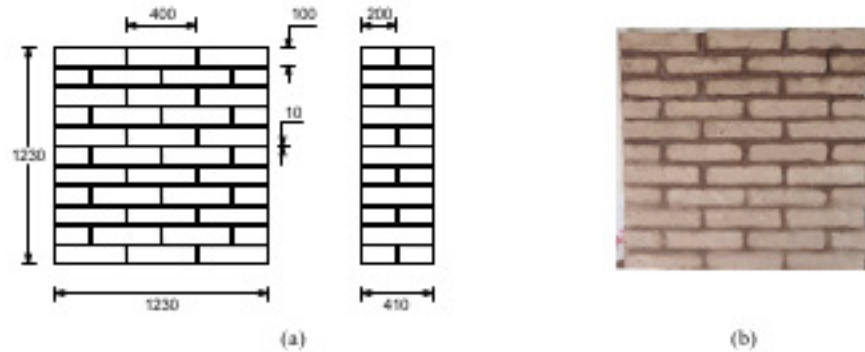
Geometry and layout of unreinforced specimens: (a) frontal and transverse sections and (b) picture.
